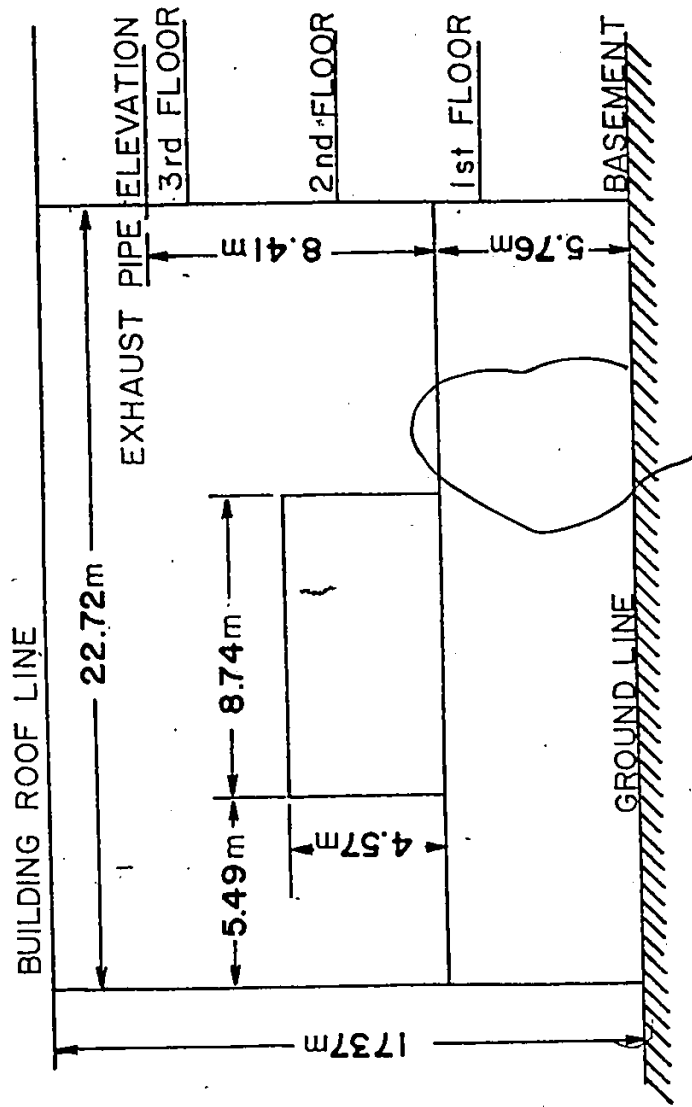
LOCATION OF ENGINE LABORATORY, NORTH ELEVATION VIEW OF BUILDING
